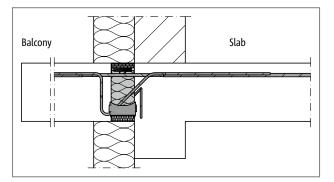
Schöck Isokorb® T type K-E, K-T: Connection for edge beam and thermal insulation composite system (WDVS)
